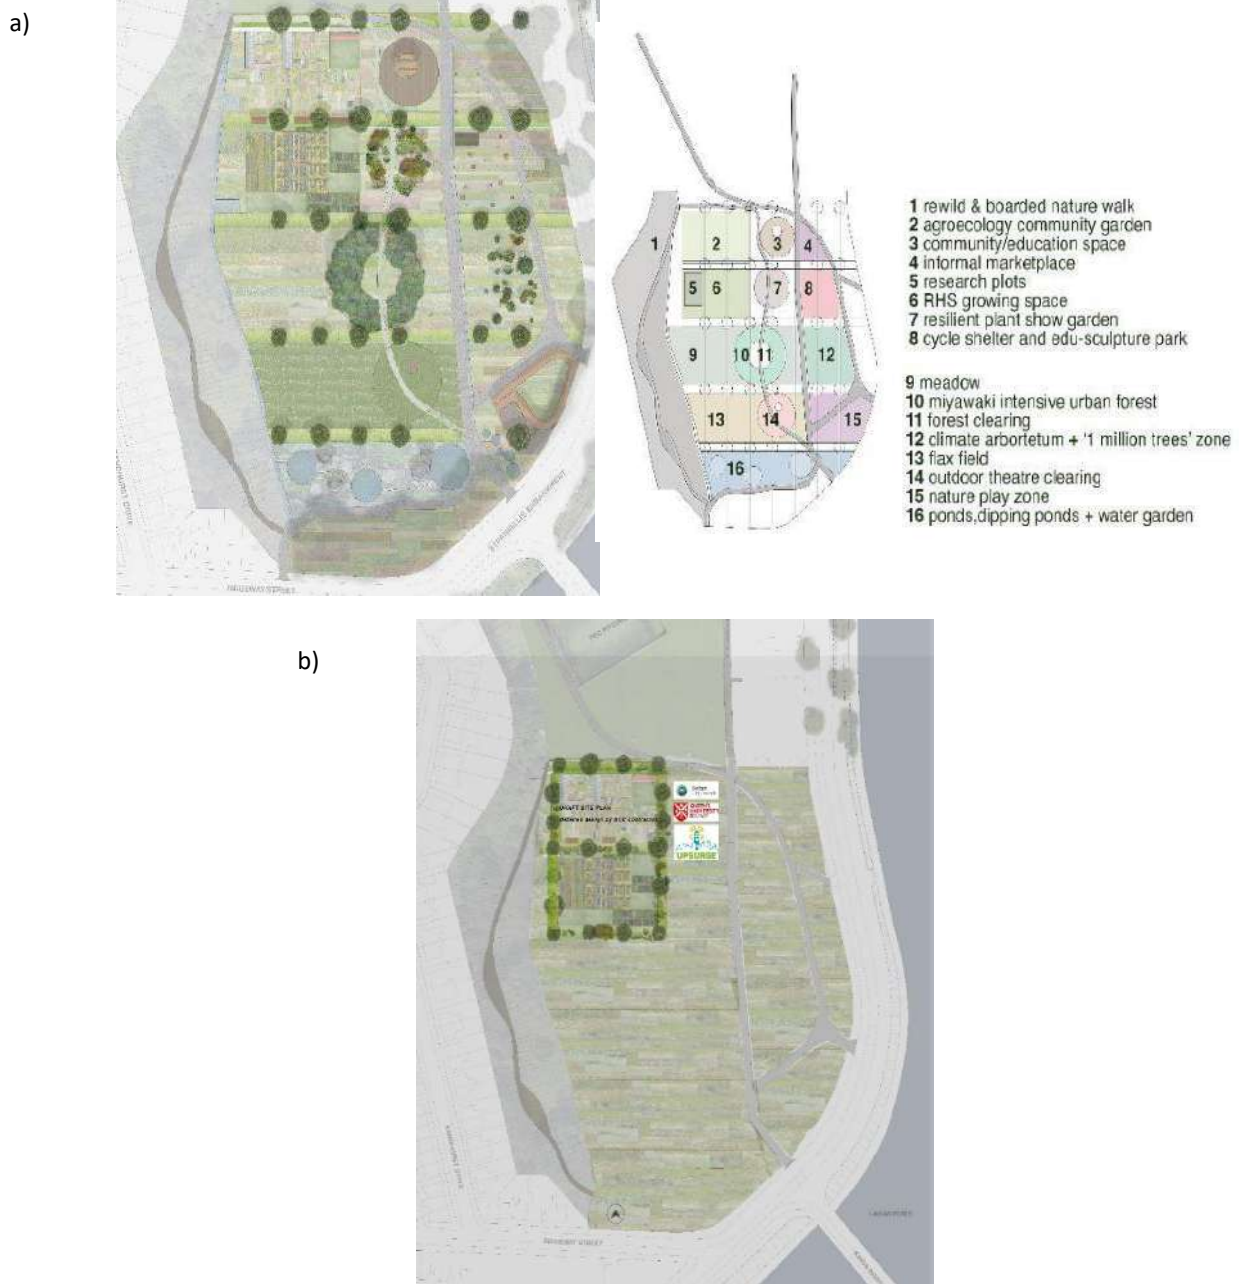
a) Conceptual Design of Belfast site and b) Phase 1 construction of the site
